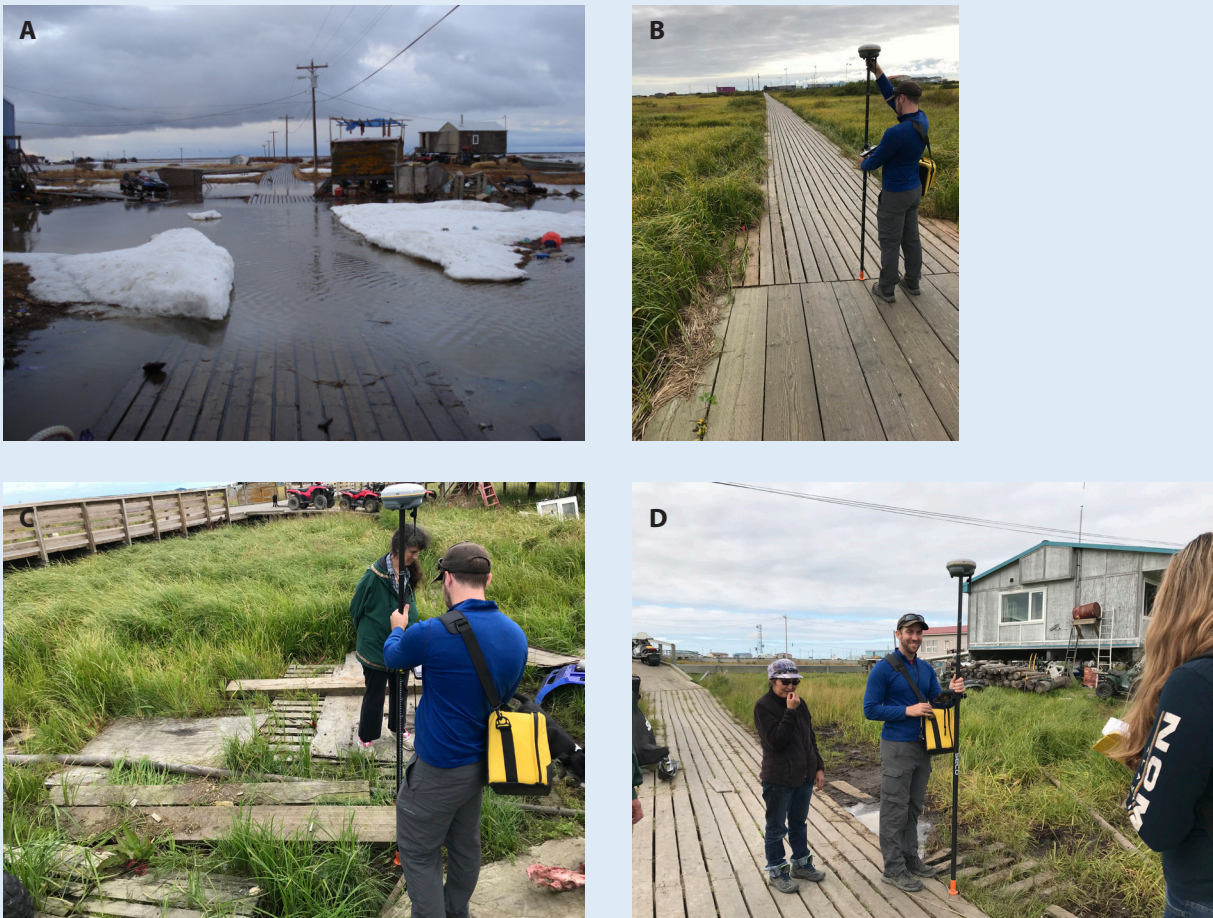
A. Flooding of the boardwalks in the Blackberry Subdivision in 2008. Photo: Carin Finch. B. Elevation measurement of the old boardwalk north of the subdivision (photo in opposite direction to A). C, D. Elevation measurement of old boardwalk in the subdivision.
